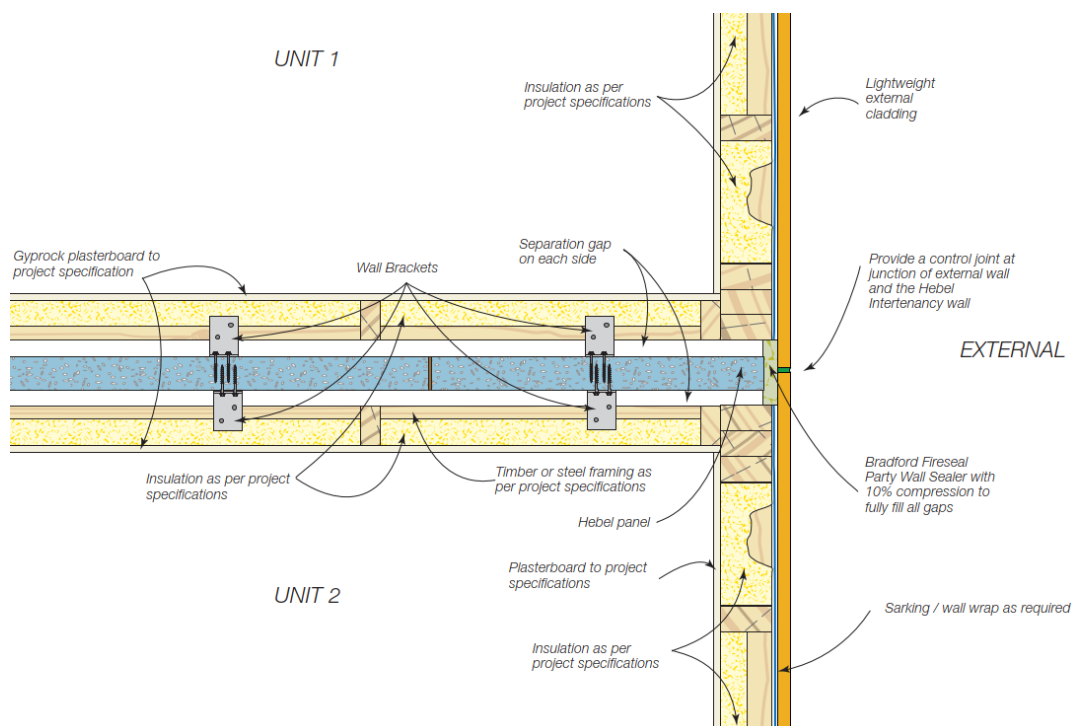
Junction detail of lightweight external cladding (direct fixed to studs) and Hebel partywall
